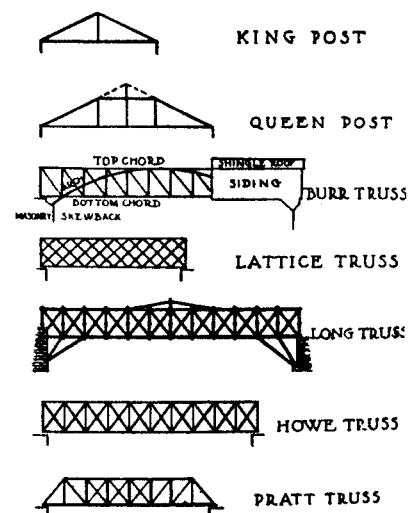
American timber truss bridges of the 1850's. The Howe, Pratt and later the Whipple trusses proved to be economical and durable when adapted to iron and steel construction.
